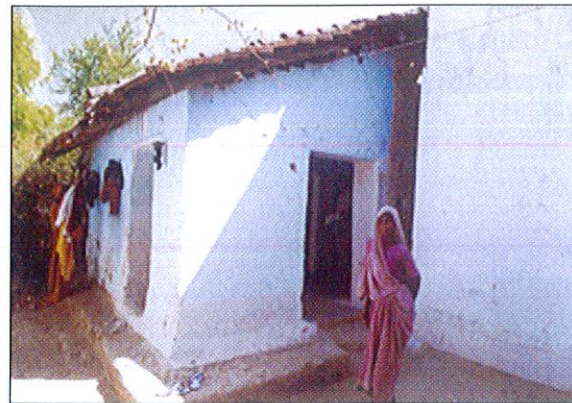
G1 Cracks (a) Fine diagonal cracks in Brick Wall House with Tile Roof
